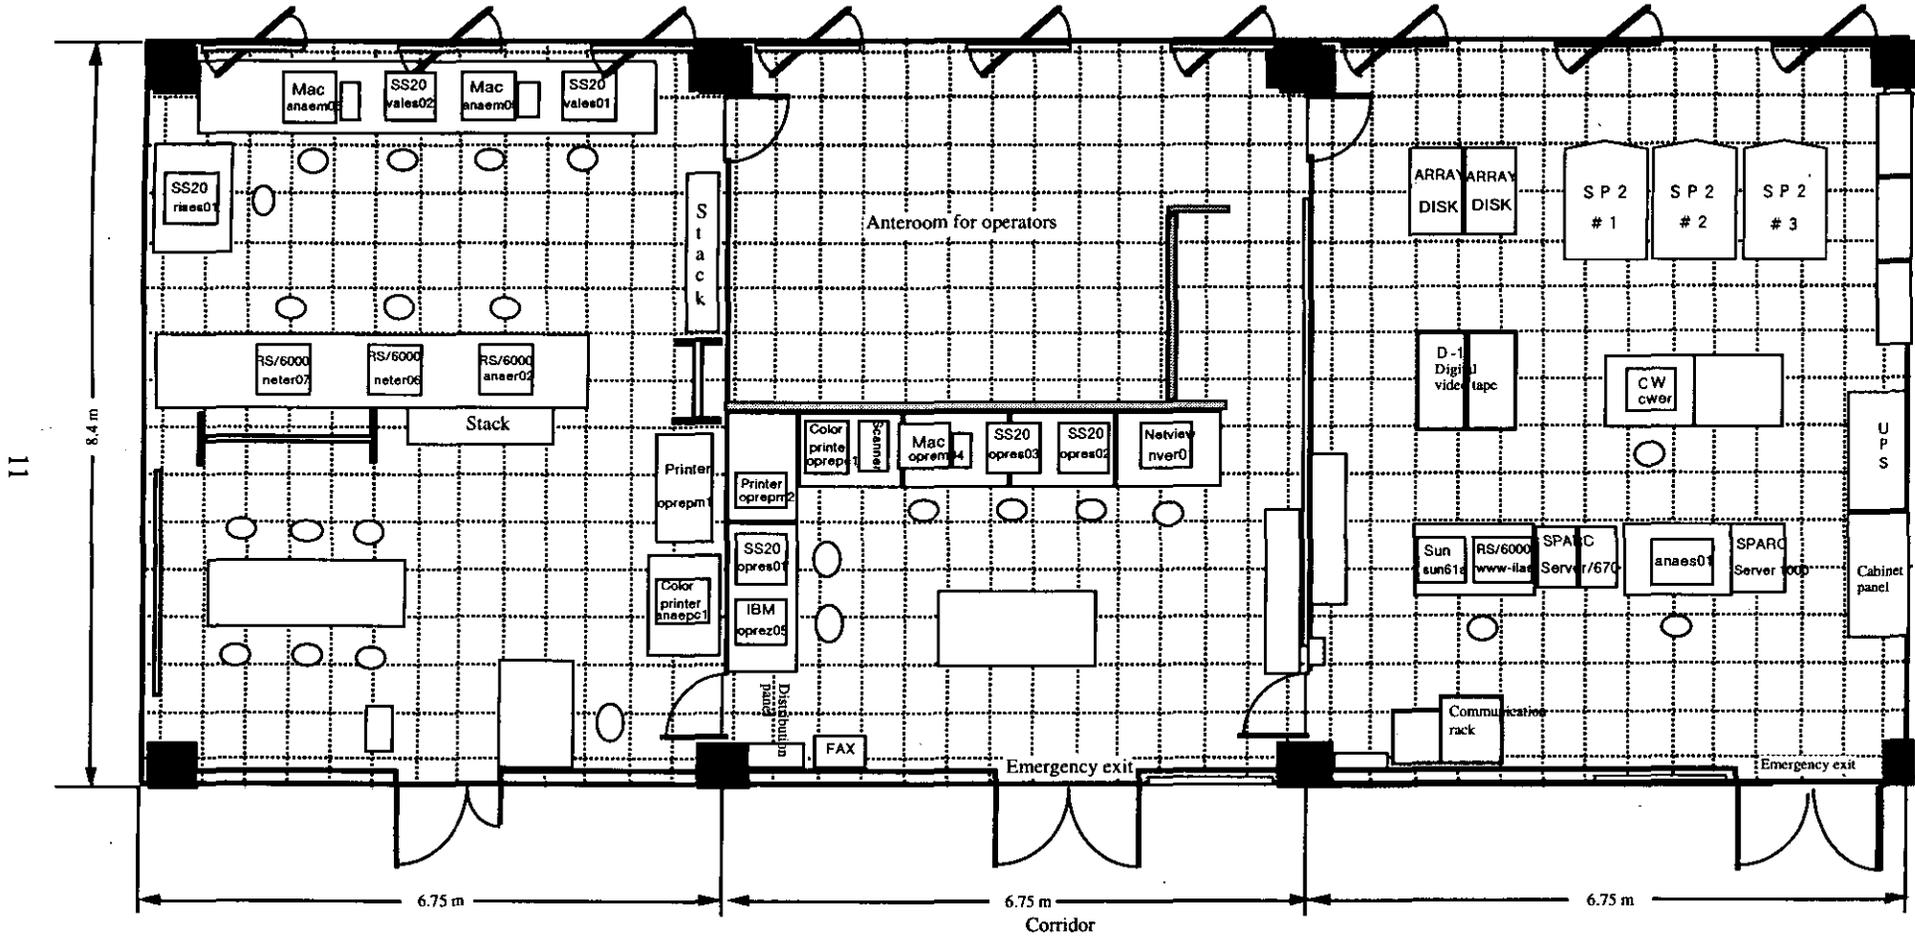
Layout of ILAS & RIS DHF, 3rd Floor of Main Research Building III
